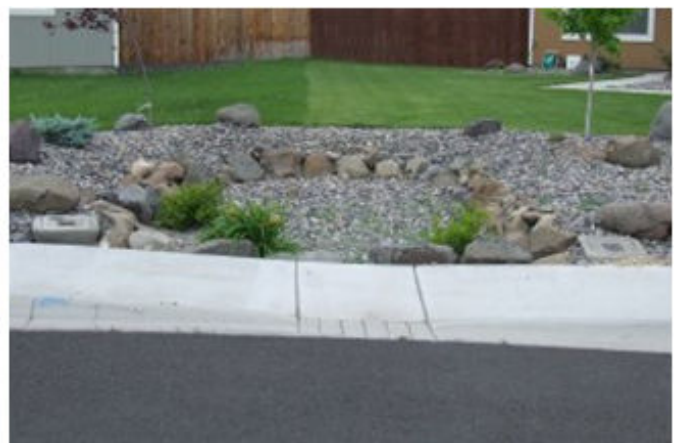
Front yard bioswales illustrating sloped sidewalks, curb openings, and graded lawn depressions
